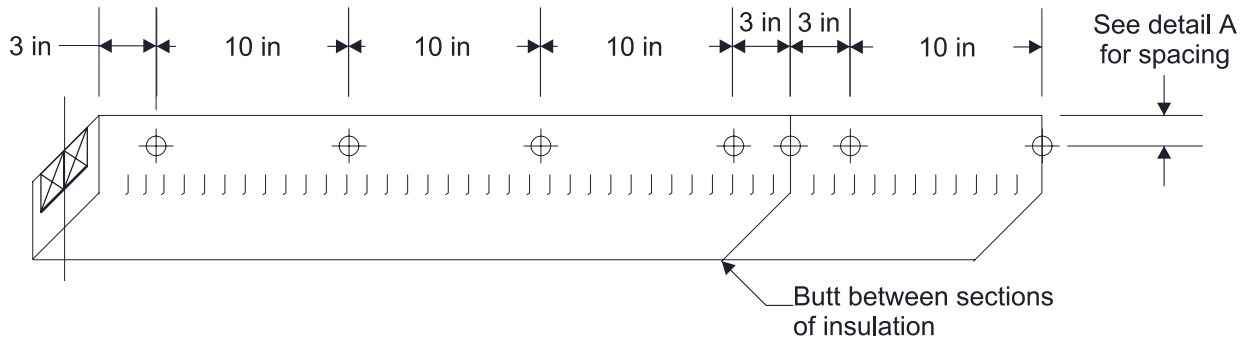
Detail B - stud spacing on 4-in x 4-in stiffener (projection view).
